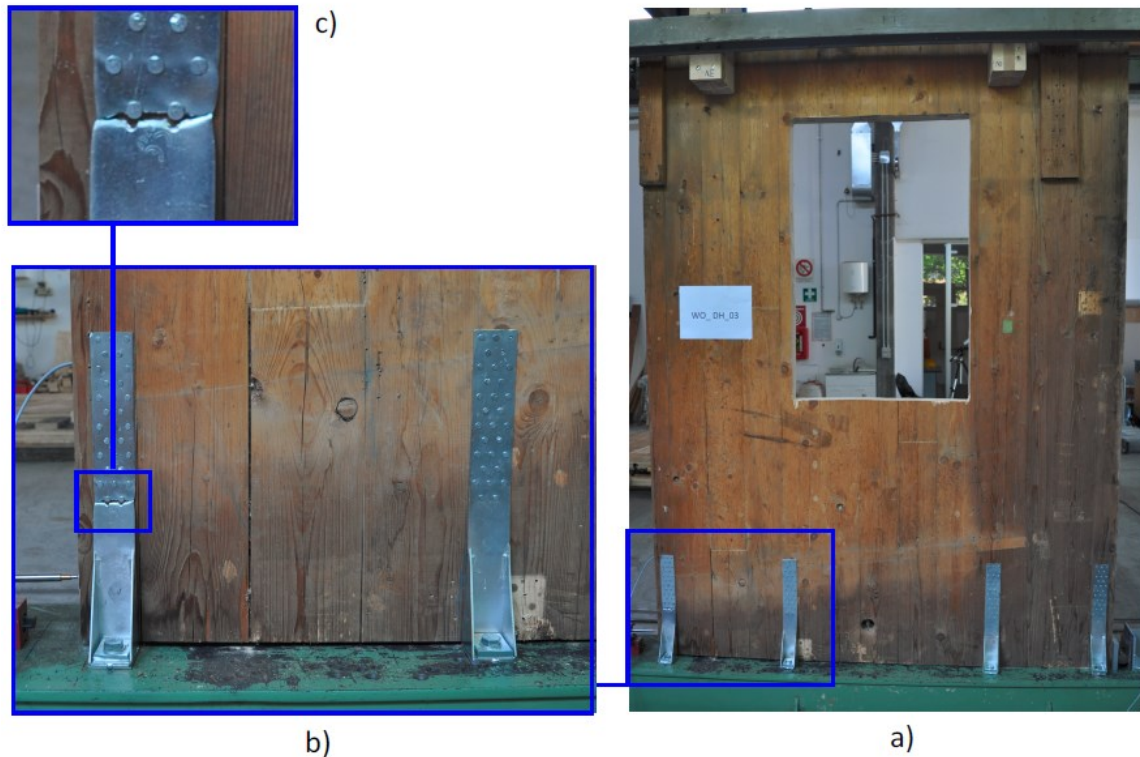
Failure mechanism achieved at the end of the test for specimen 03
